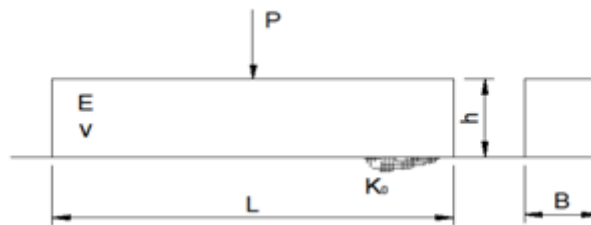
OPCC beam with no notch on Winkler’s foundation subjected to a central point load
